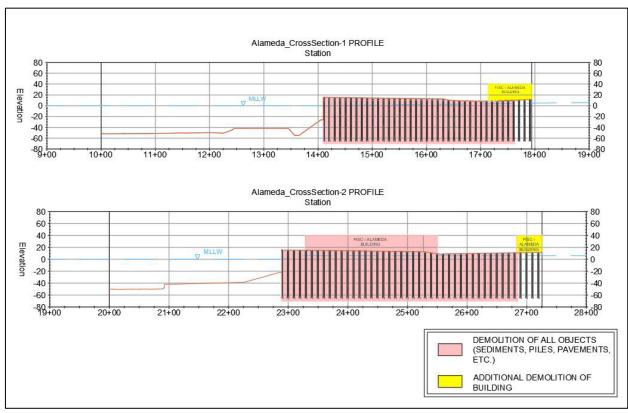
Alameda Wharf Demolition, Cross Sections with (E) bulkhead elevations
